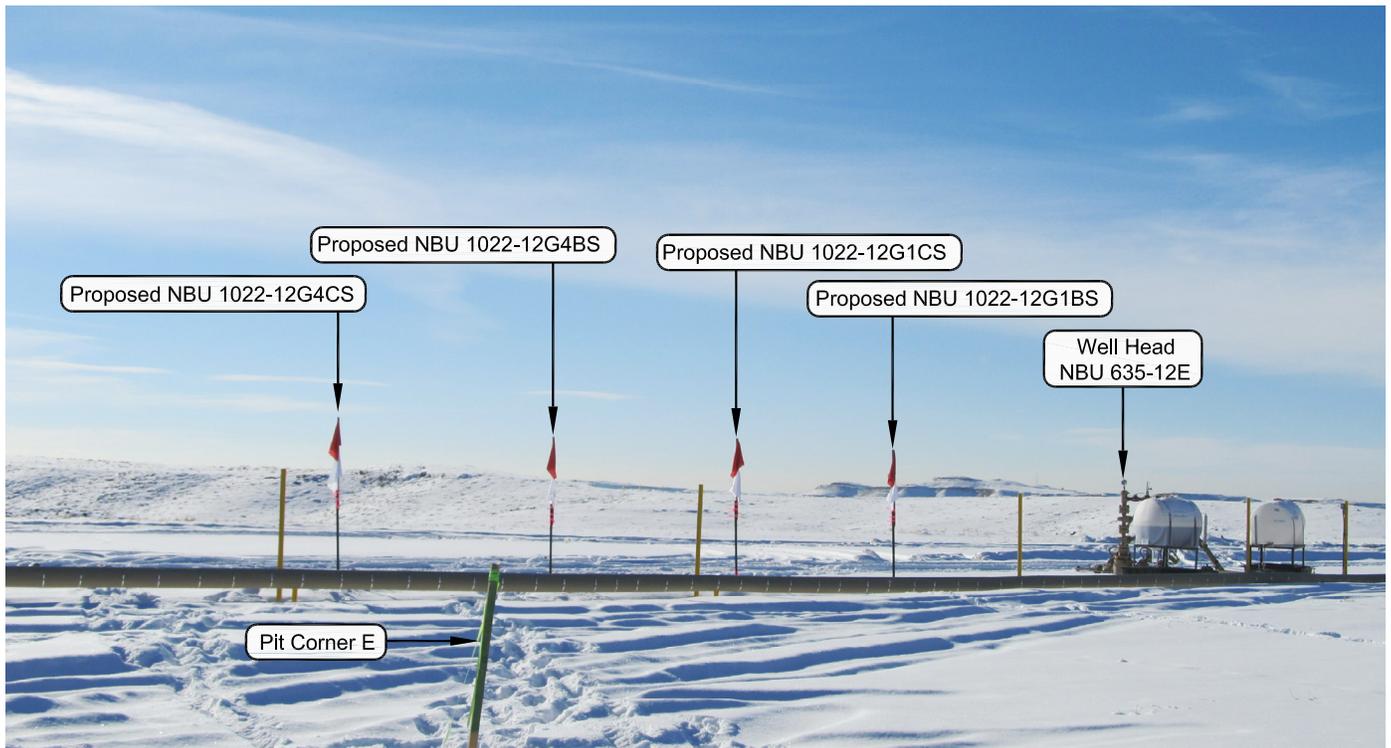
PHOTO VIEW: FROM PIT CORNER E TO LOCATION STAKE
